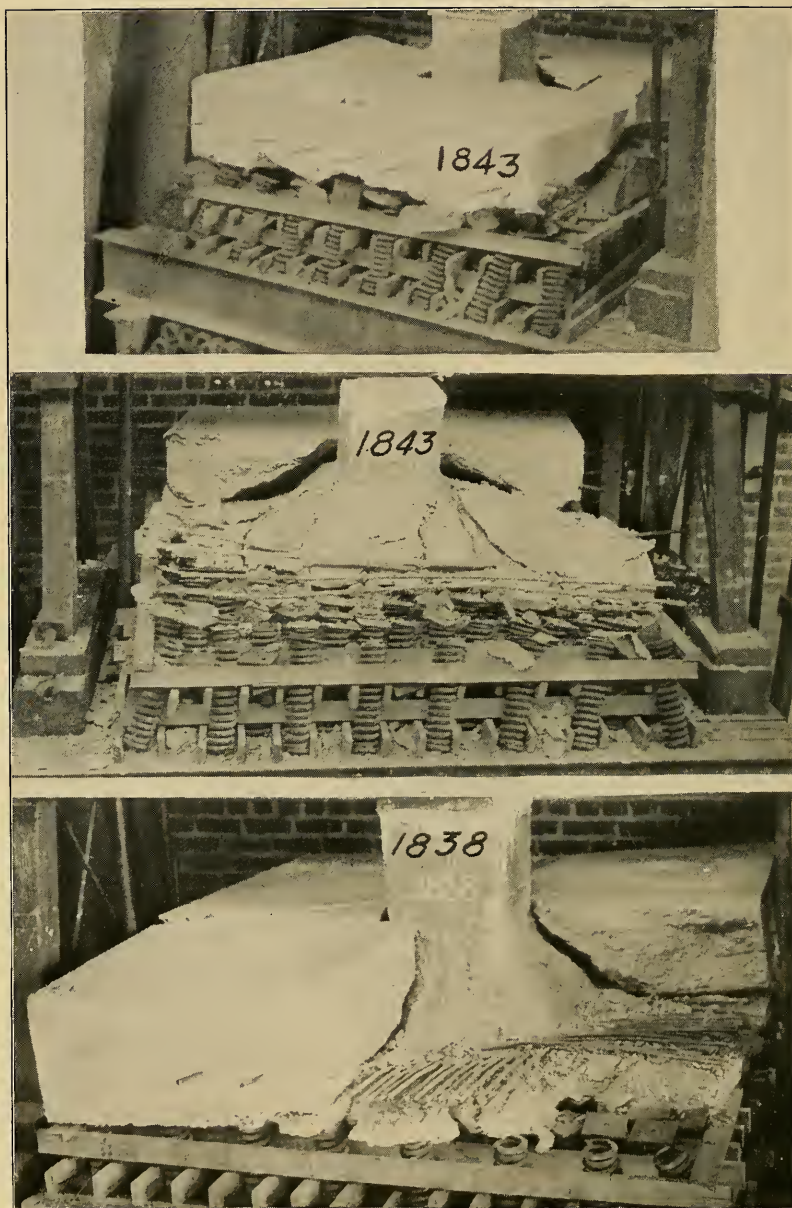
VIEWS SHOWING COLUMN FOOTINGS AFTER FAILURE.
